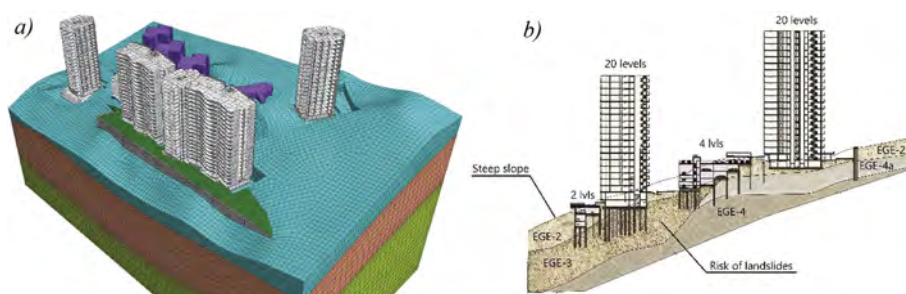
Multi-storey residential buildings located on a steep slope with a risk of landslides: *a* – spatial FEM model; *b* – geological section of the construction site, combined with the designed multi-storey buildings.
